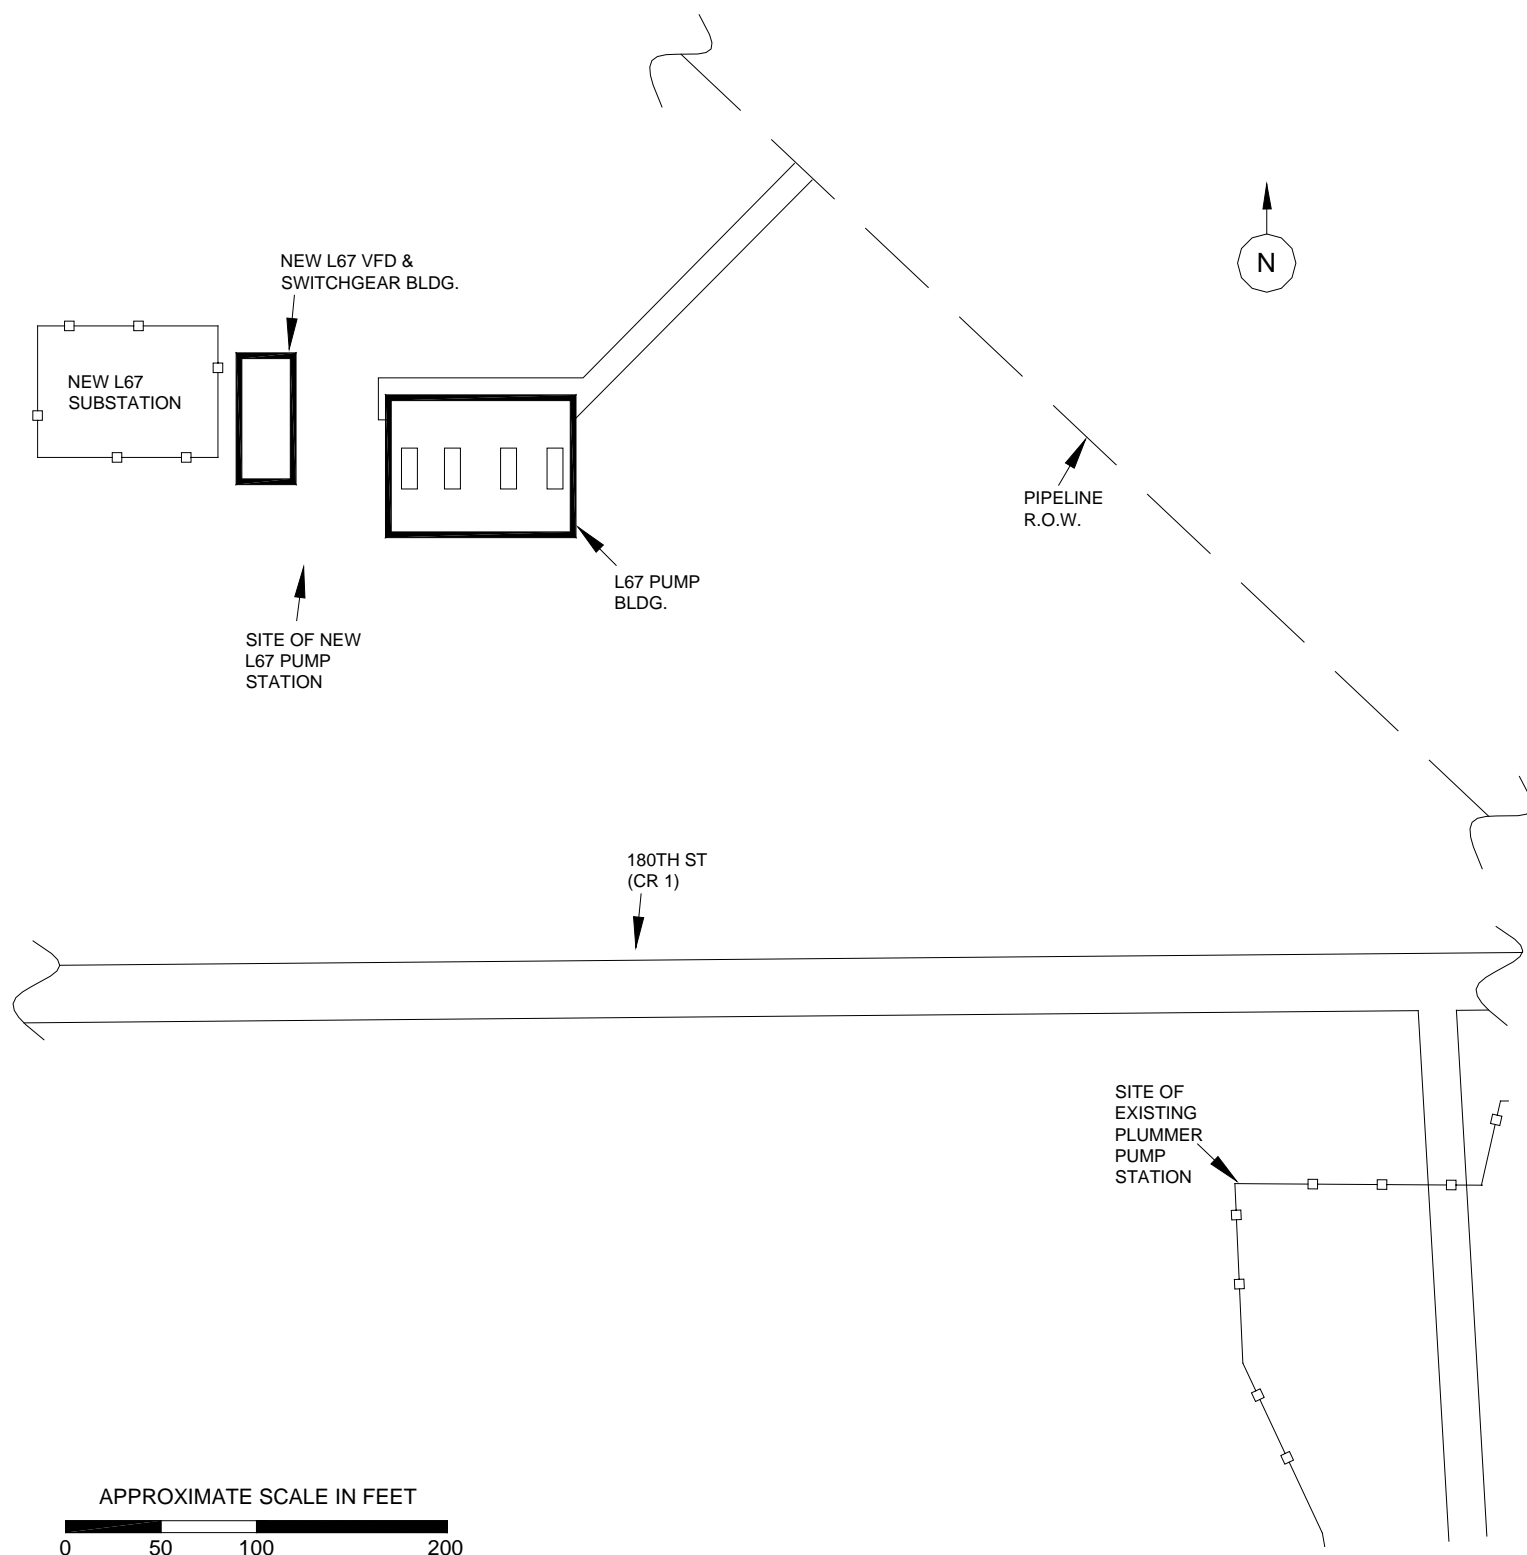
Enbridge Plummer Pumping Station: Layout of the Conceptual Layout (Plot Plan) of Buildings/Equipment associated with new L67 Station.
